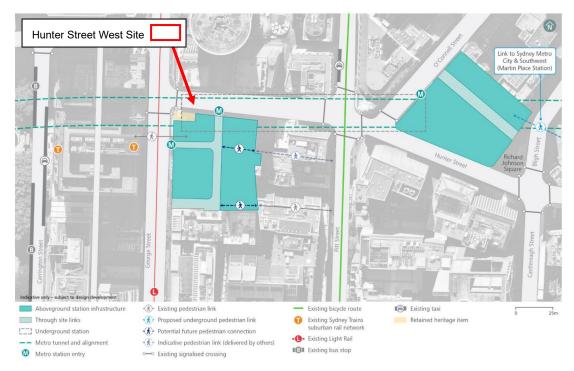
Indicative layout and key design elements – Hunter Street Station
